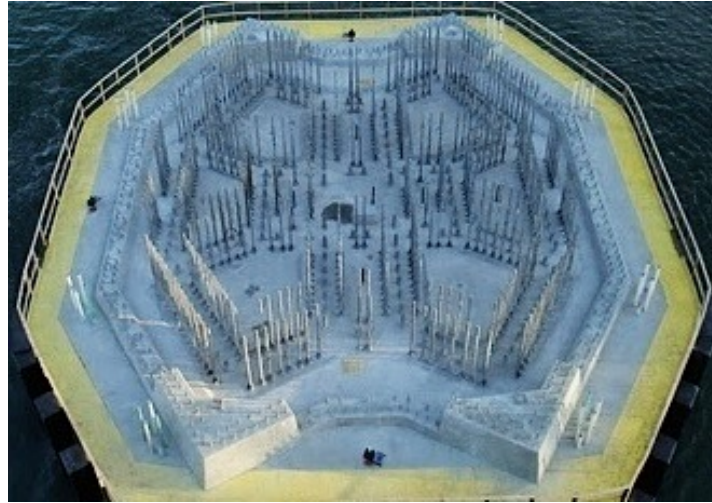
Tower base during construction [Ref.: Mason Construction Ltd.].
